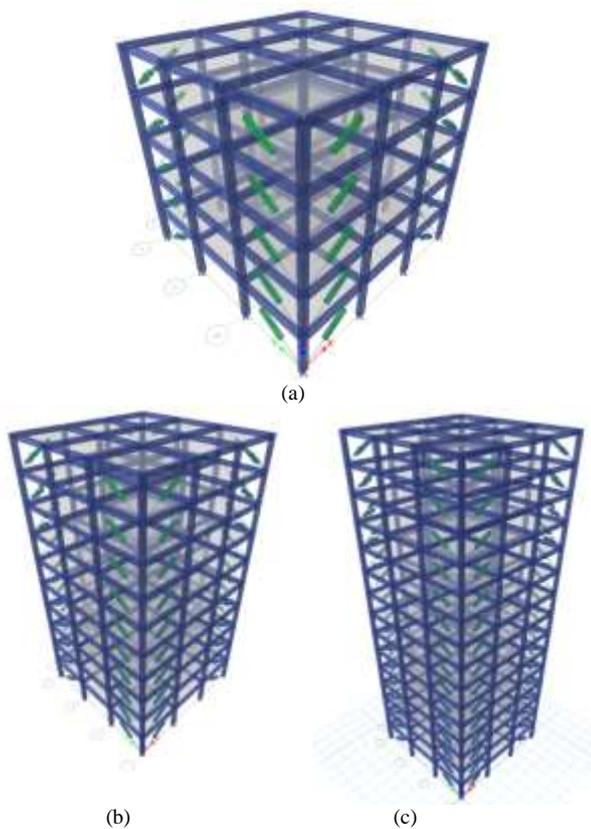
3D Model of Building (a) 5 Storey (b) 10 storey (c) 15 storey.
